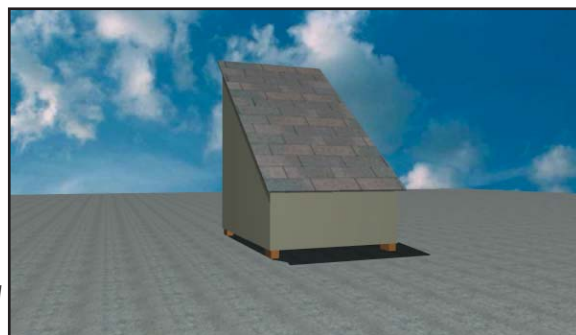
The exterior of Roof Module 2 with the access hatch visible.
